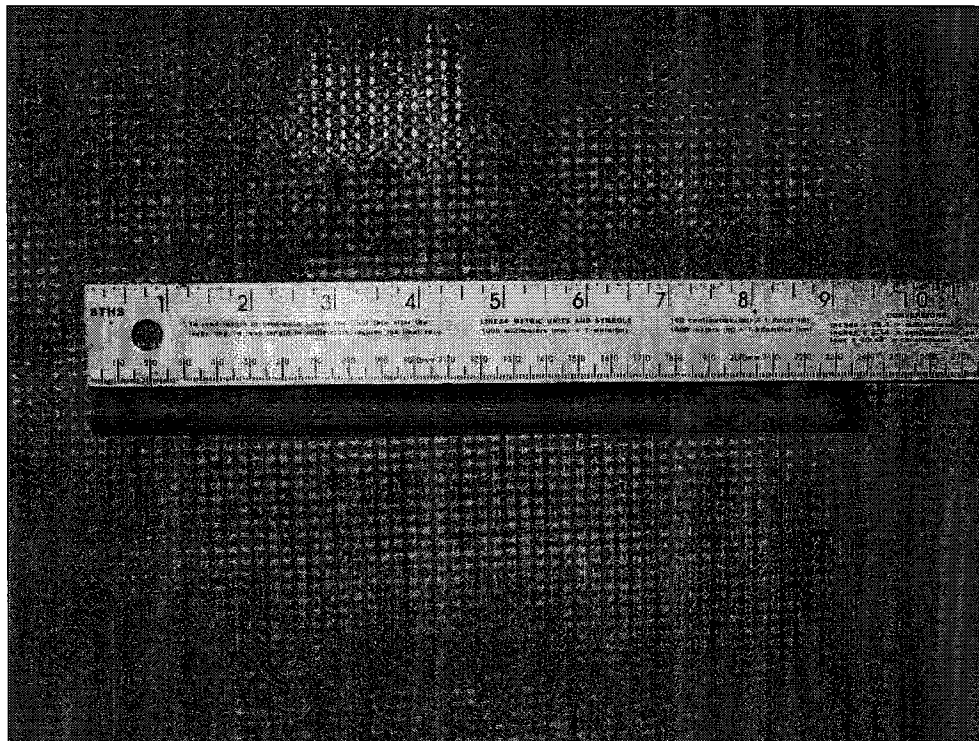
Rebar Sample S4 (East Abutment, 15M, vertical)
